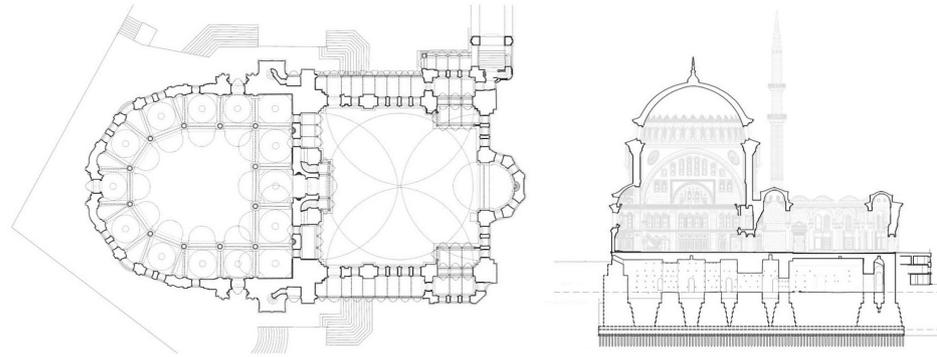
Ground floor plan and section through courtyard-mihrab direction of the mosque.
